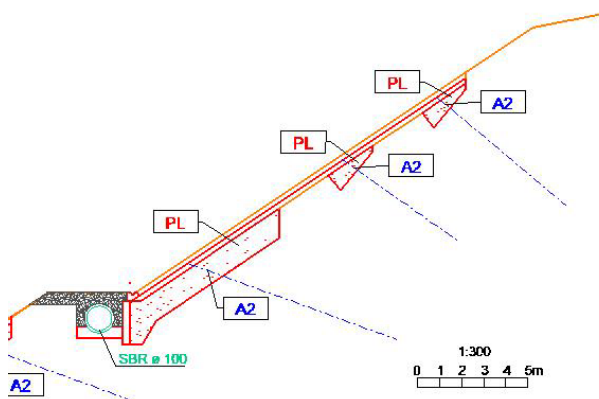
Schoren retaining wall, cross section from solid vertical line in Figure 4-17
